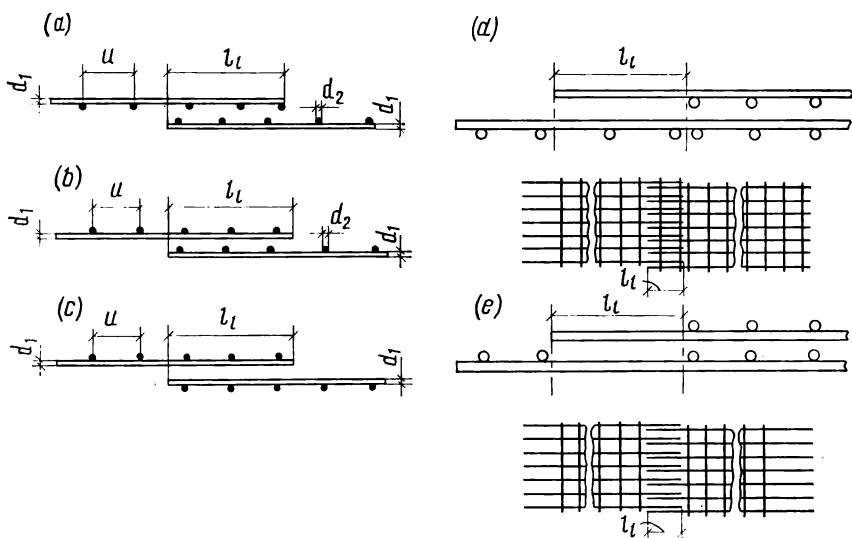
Splicing of welded-wire fabric in the load-bearing direction
